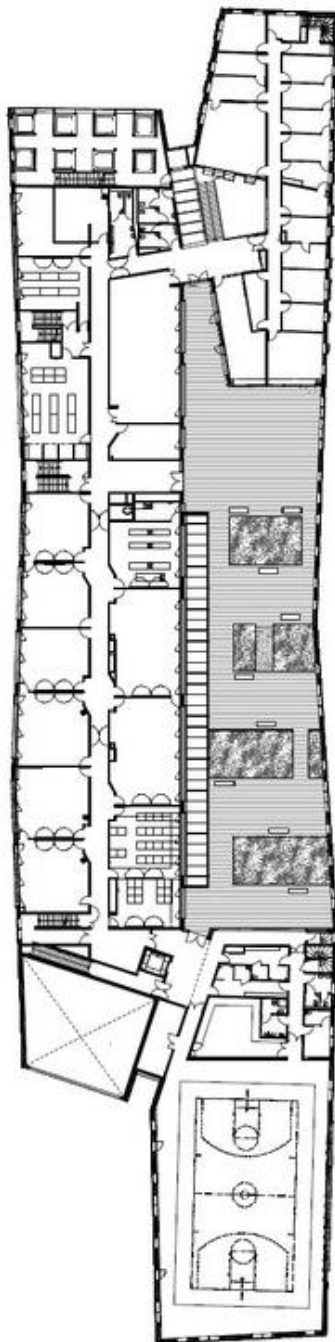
ground floor plan of the center. (Source: Archdaily)
